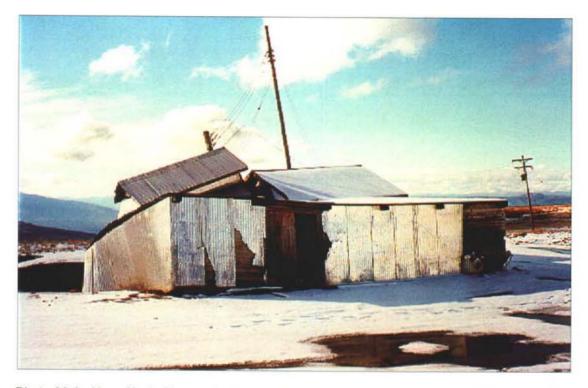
Keno No.9 Shamrock J18 Vein Raise Building (36-A). Note collapse of building into failing underground workings and fencing around opening. Also, transformer on power pole in background. (Azimuth 2900).
